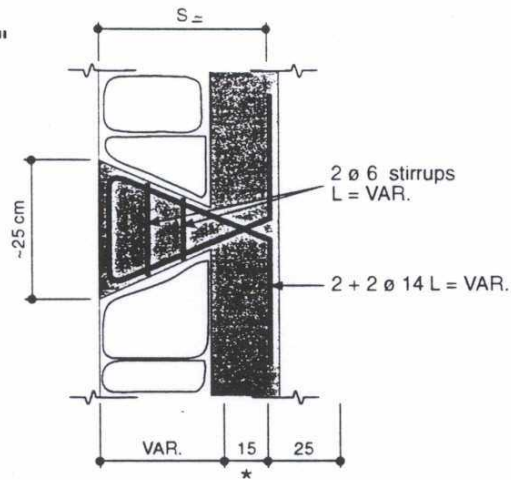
E: Seismic Strengthening - Installation of New Steel Anchors Grouted Into Existing Walls and
